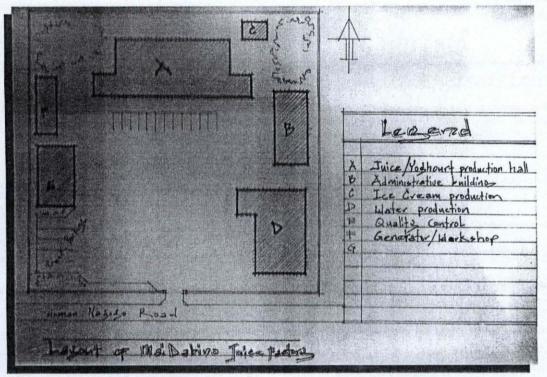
; Sketch of the Layout Source; Author's Fieldwork, 2008
